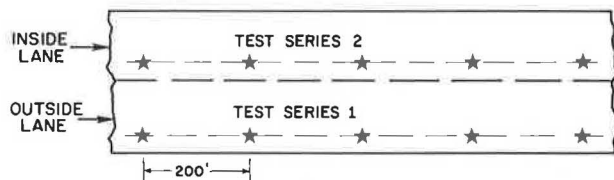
Example of test series for a two-lane highway asphalt concrete section.
